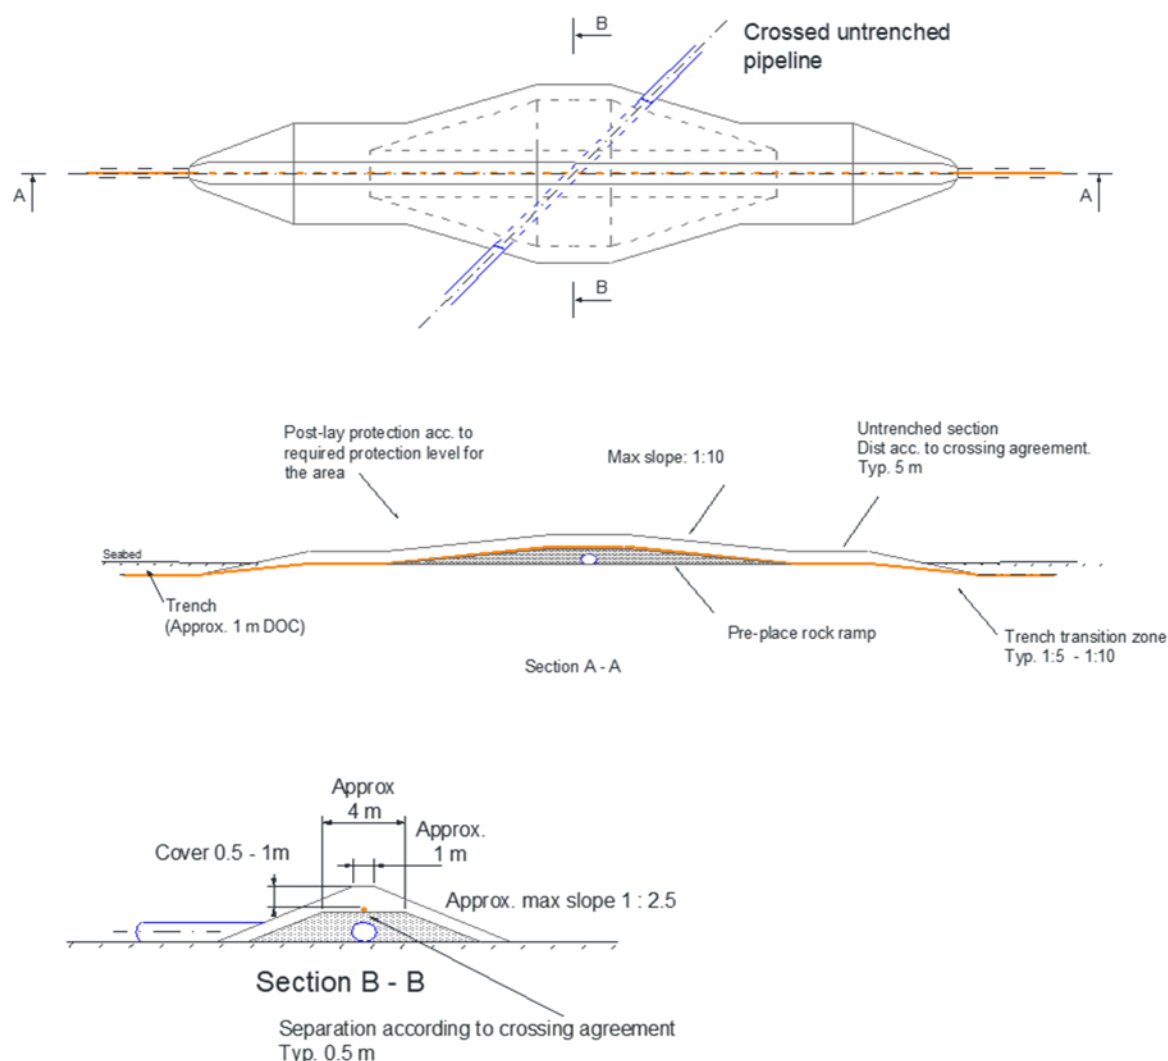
Crossings Design A - Crossing Un-trenched Pipeline
